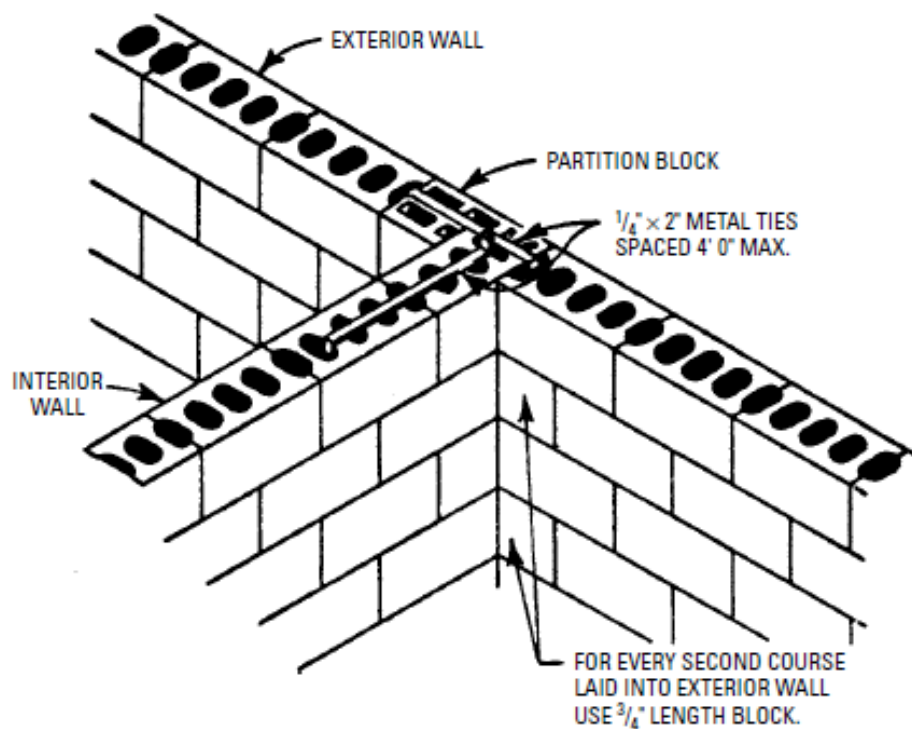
Detail of joining an interior and exterior wall in concrete-block construction.
